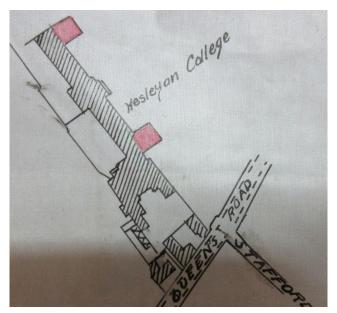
Block plan showing north and south wings, both of which acquired a new storey, 1903.
